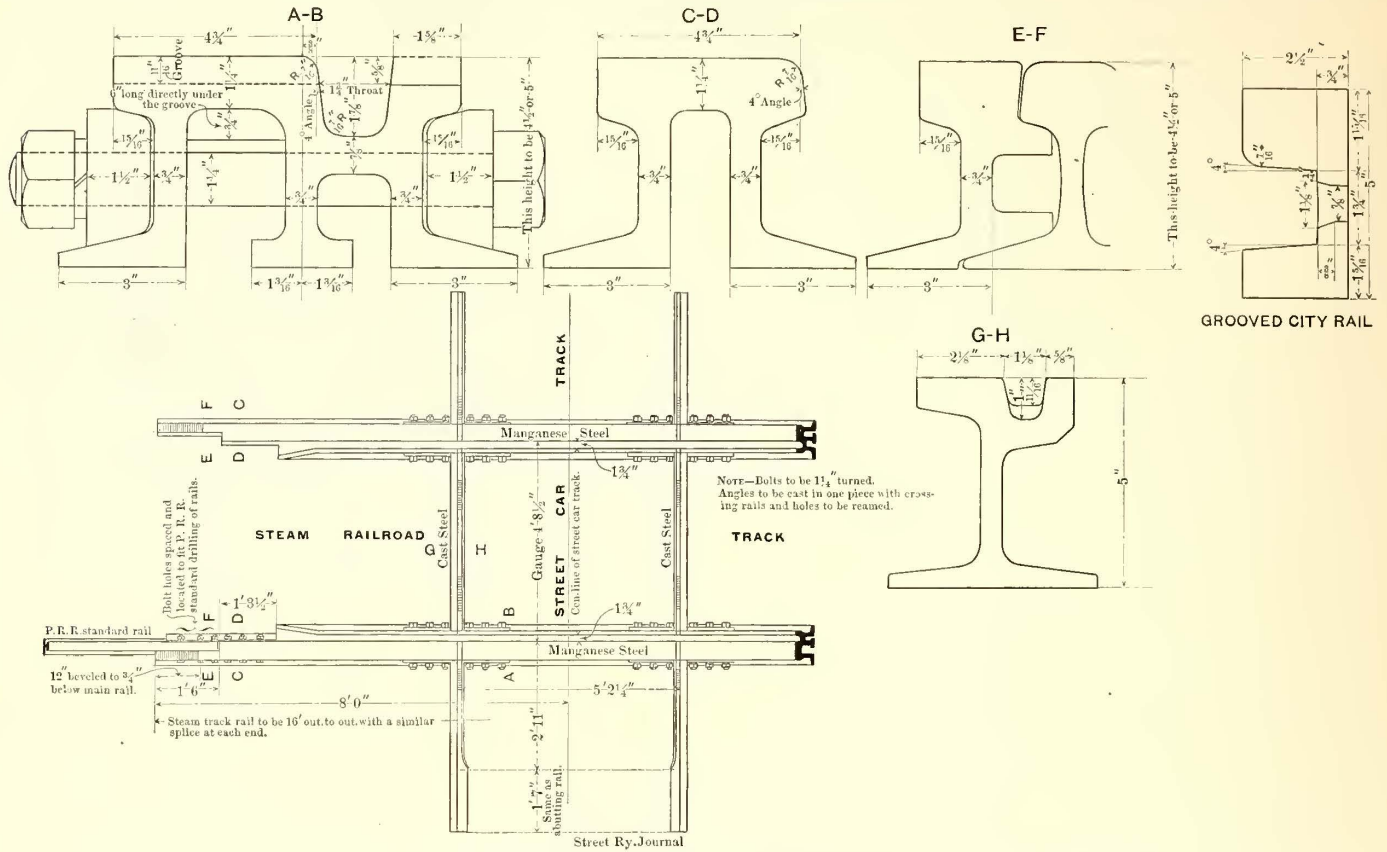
PLAN AND SECTIONS OF OLD FORM OF STANDARD STEAM RAILROAD CROSSING
